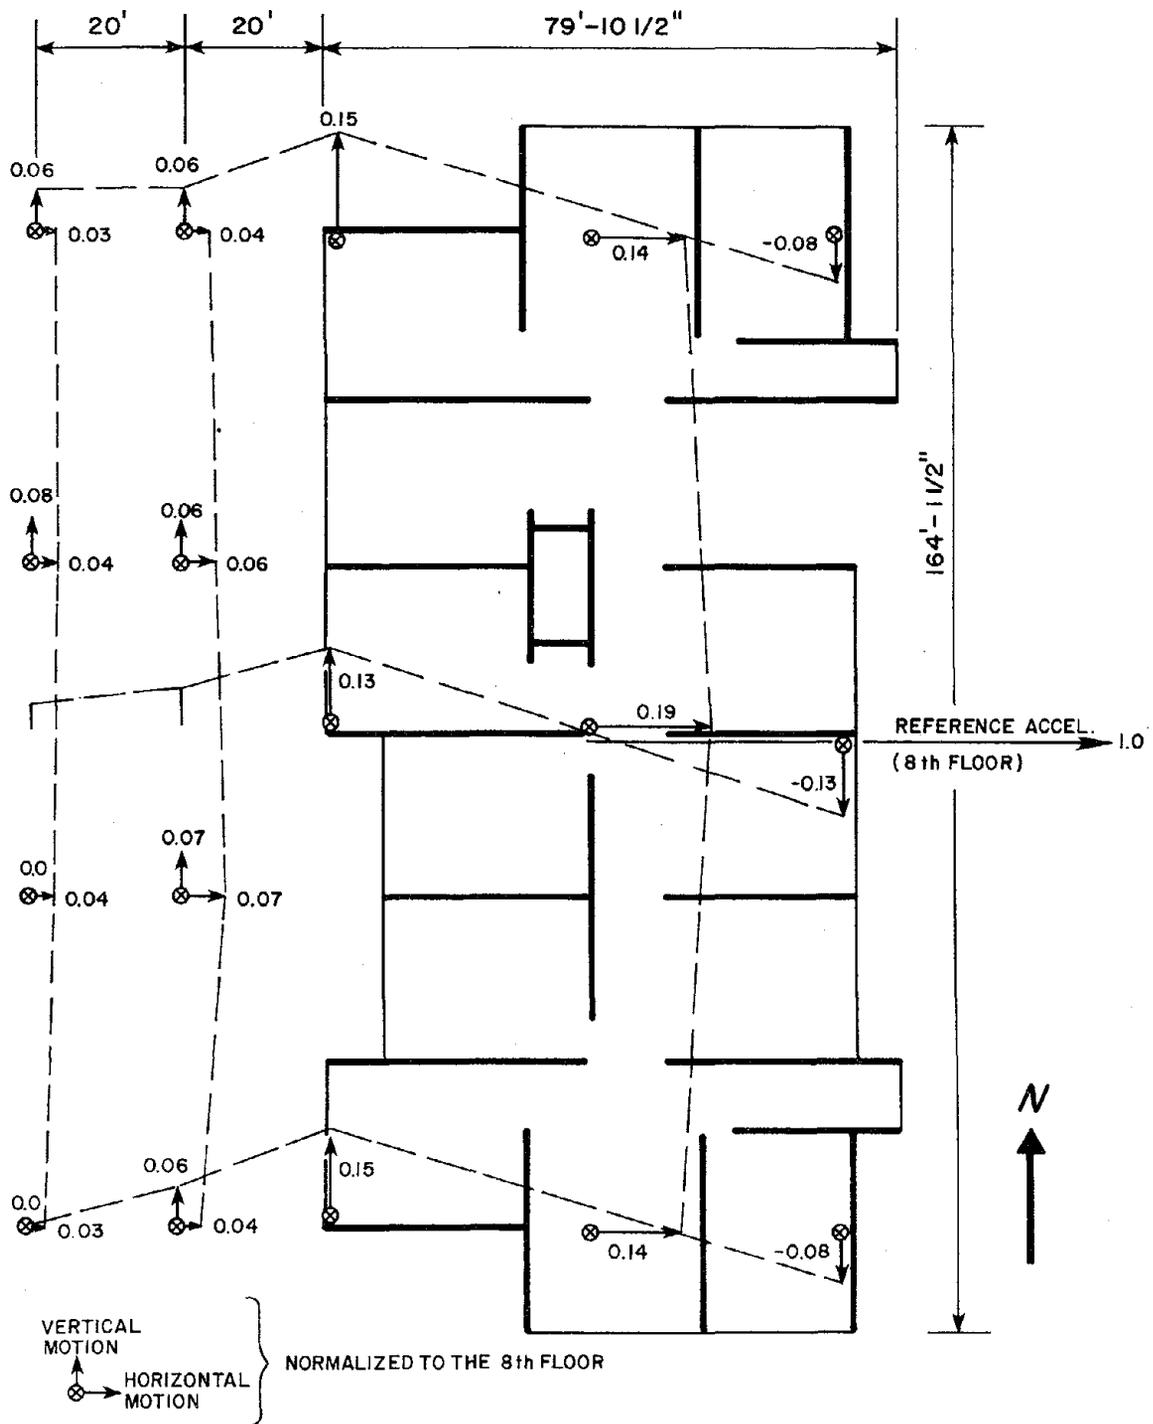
Vertical and Horizontal Ground Motion for EW Forcing ( $f=3.23$  cps)
